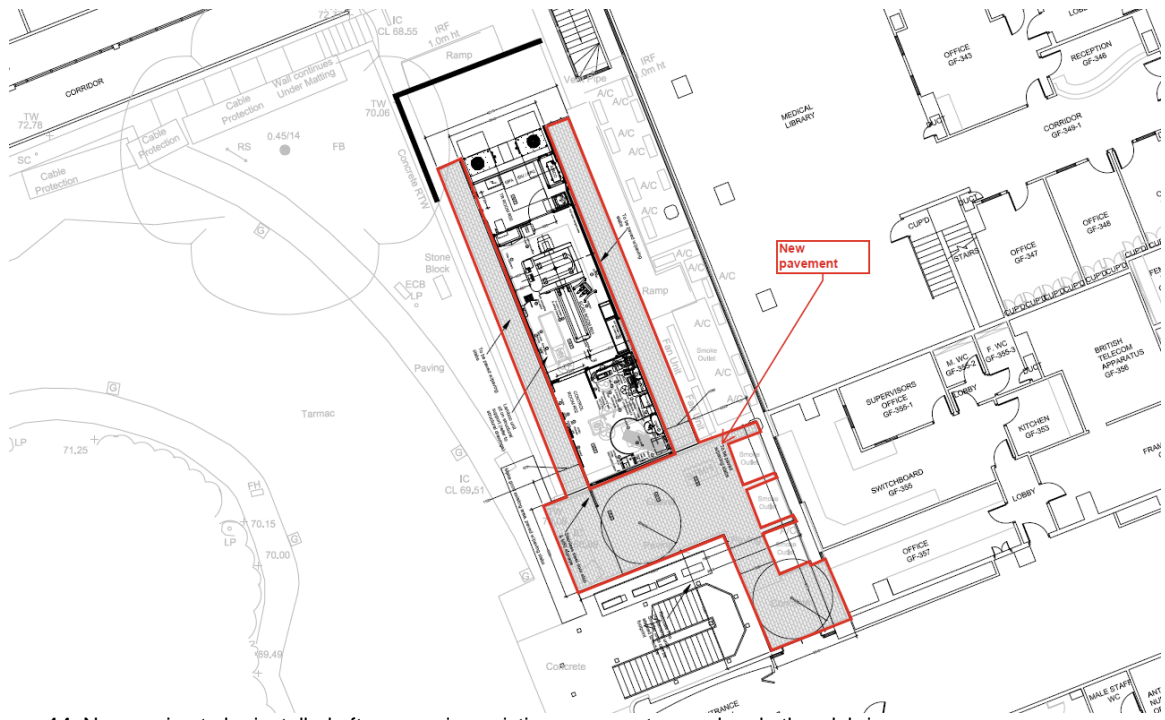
New paving to be installed after removing existing pavement, gravel and other debris.
